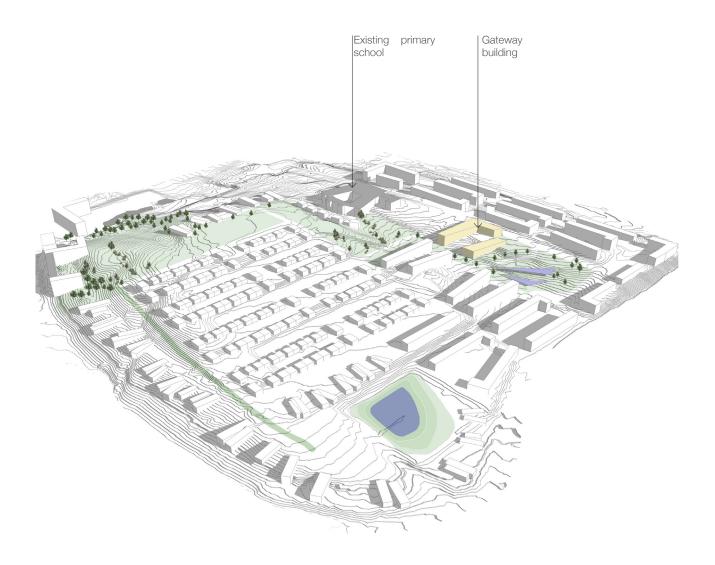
Gateway and green corridor, Collective Architecture 2010. Not to scale.
